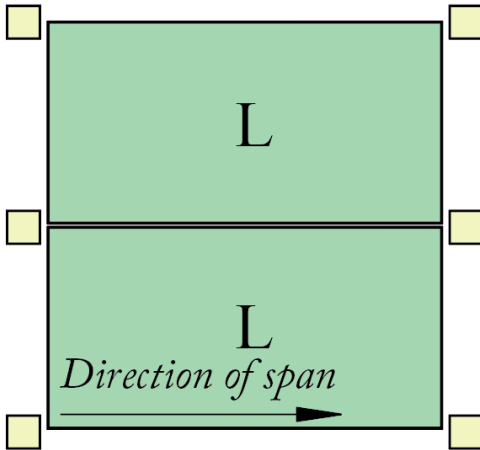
Plan of configuration 1 through 3 (floor elements in parallel)
